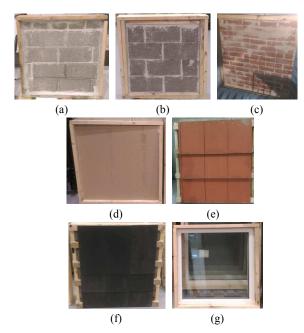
Tested structures: (a) solid concrete block wall, (b) cavity concrete block wall, (c) red brick wall, (d) plasterboard wall (e) tile roof, (f) slate roof, and (g) window. Only one window is shown since there is no visual difference with the rest of the windows.
